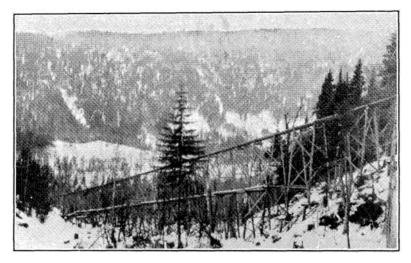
The type of trestle support used on a high chute, The maXiITIUnl elevation above ground was 45 feet. Eastern Canada.
